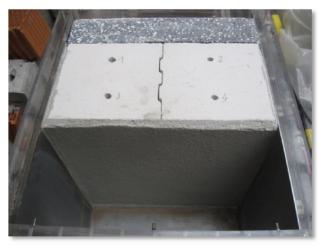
Composite wall construction; single shell wall of light (aerated) concrete blocks with thermal insulation composite system.
